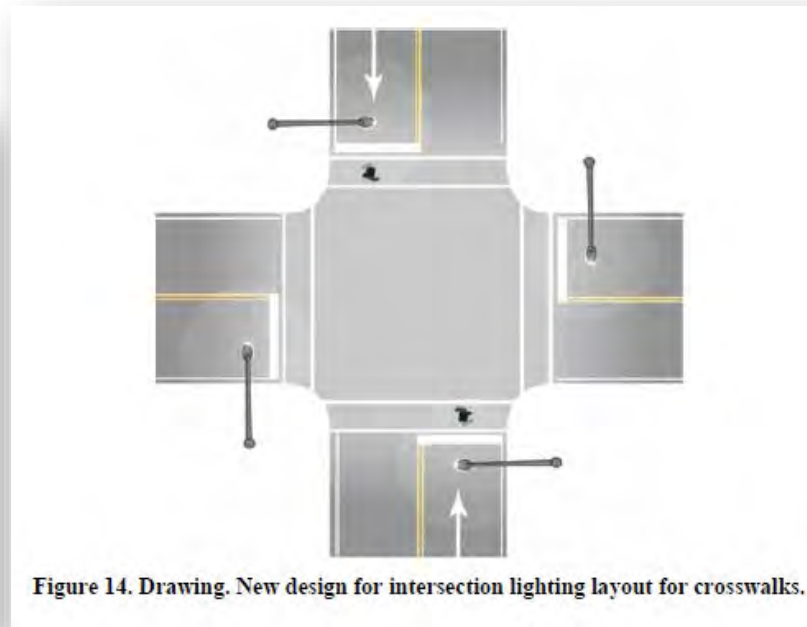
Drawing. New design for intersection lighting layout for crosswalks.
